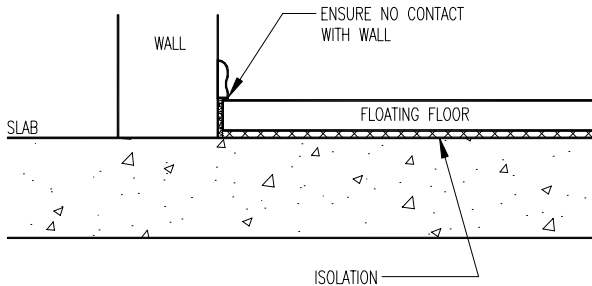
Treatment Around the Perimeter of Isolated Floors
